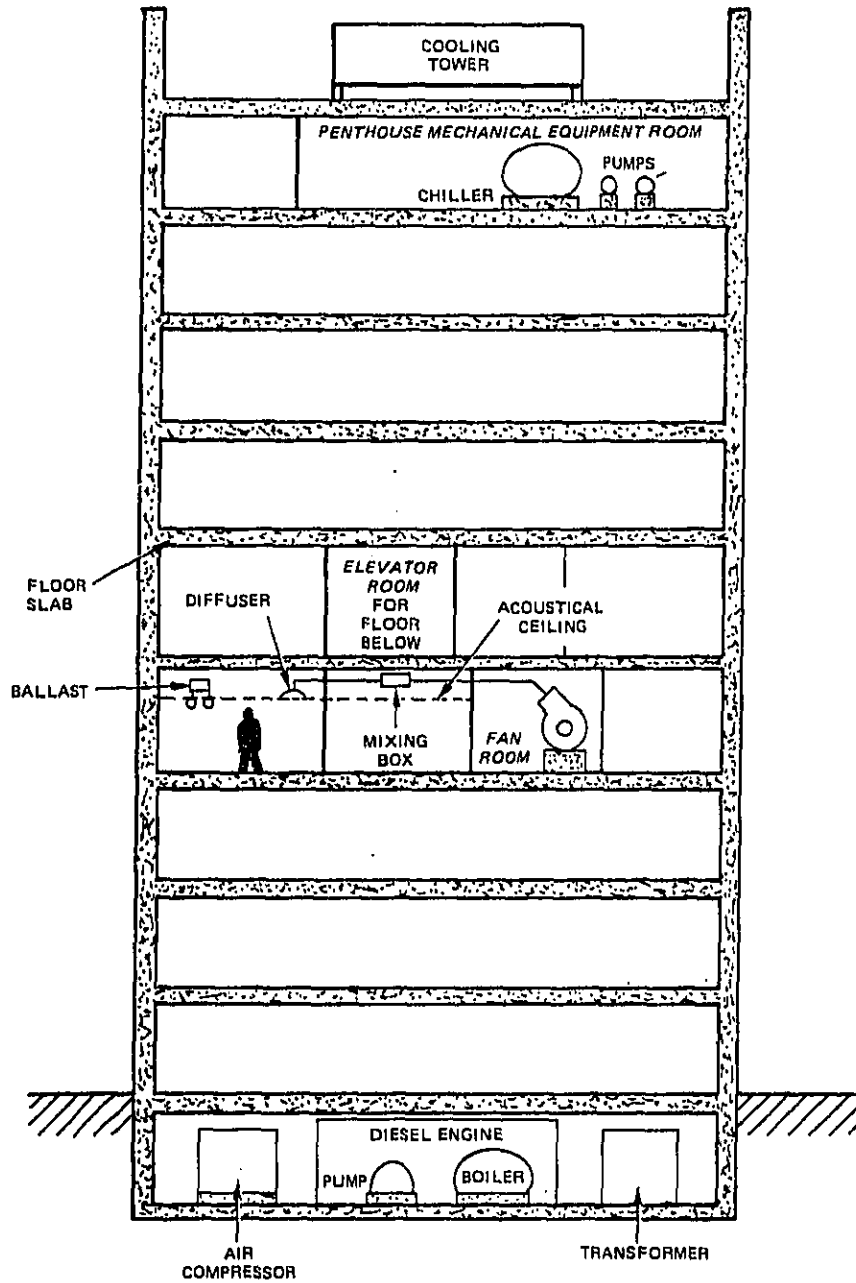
Cross-Section of a Typical Multistory Building Showing Building Equipment
